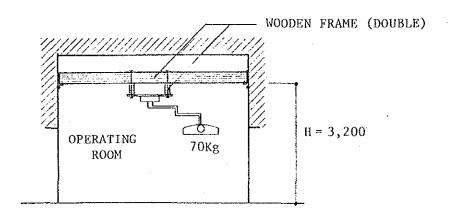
OPERATING LIGHT INSTALLATION PLAN
